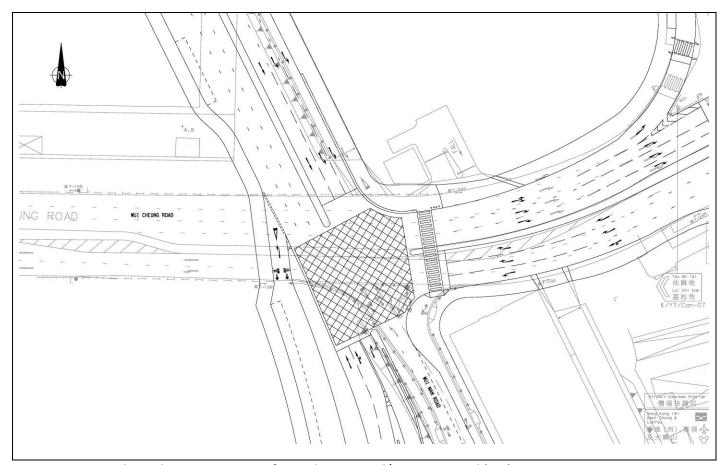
Planned Junction Layout of Wui Cheung Road/Wui Man Road (J14)
